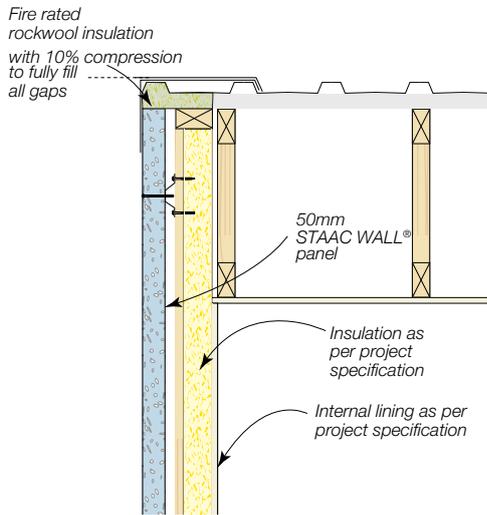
Typical Dual Zero Boundary roof parapet detail
